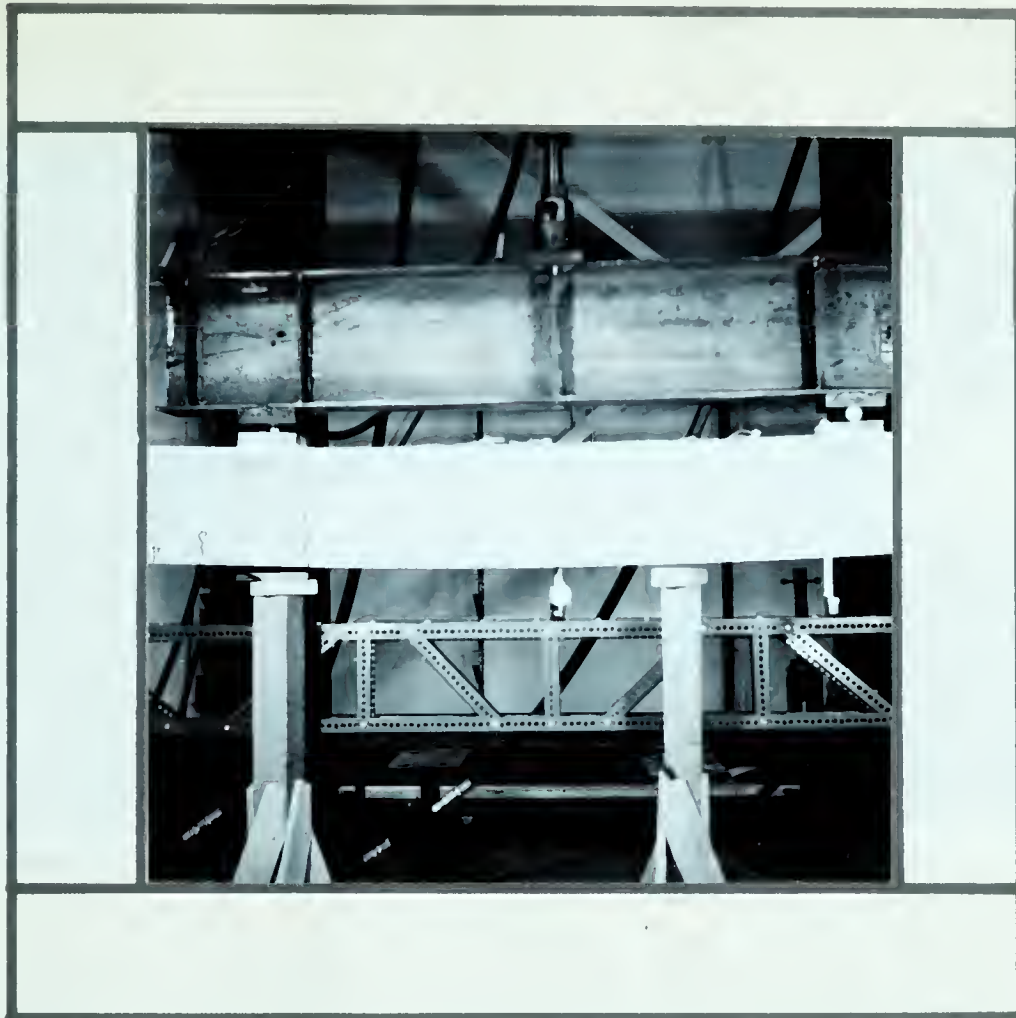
TYPICAL CRACKING PATTERN FOR A TWO-POINT LOADED BEAM WITH 2 STRANDS
